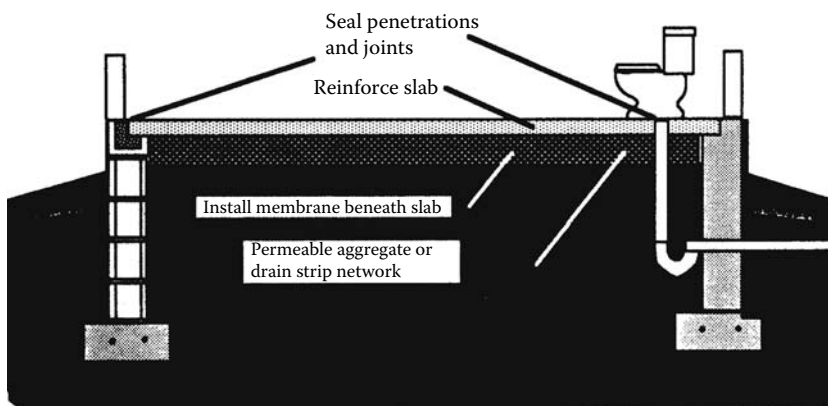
Summary of mechanical barrier approach for slab-on-grade foundations. (Adapted from U.S. EPA, *Radon-Resistant Construction Techniques for New Residential Construction—Technical Guidance*, EPA/625/2-91/032, U.S. Environmental Protection Agency, Washington, DC, February 1991.)
